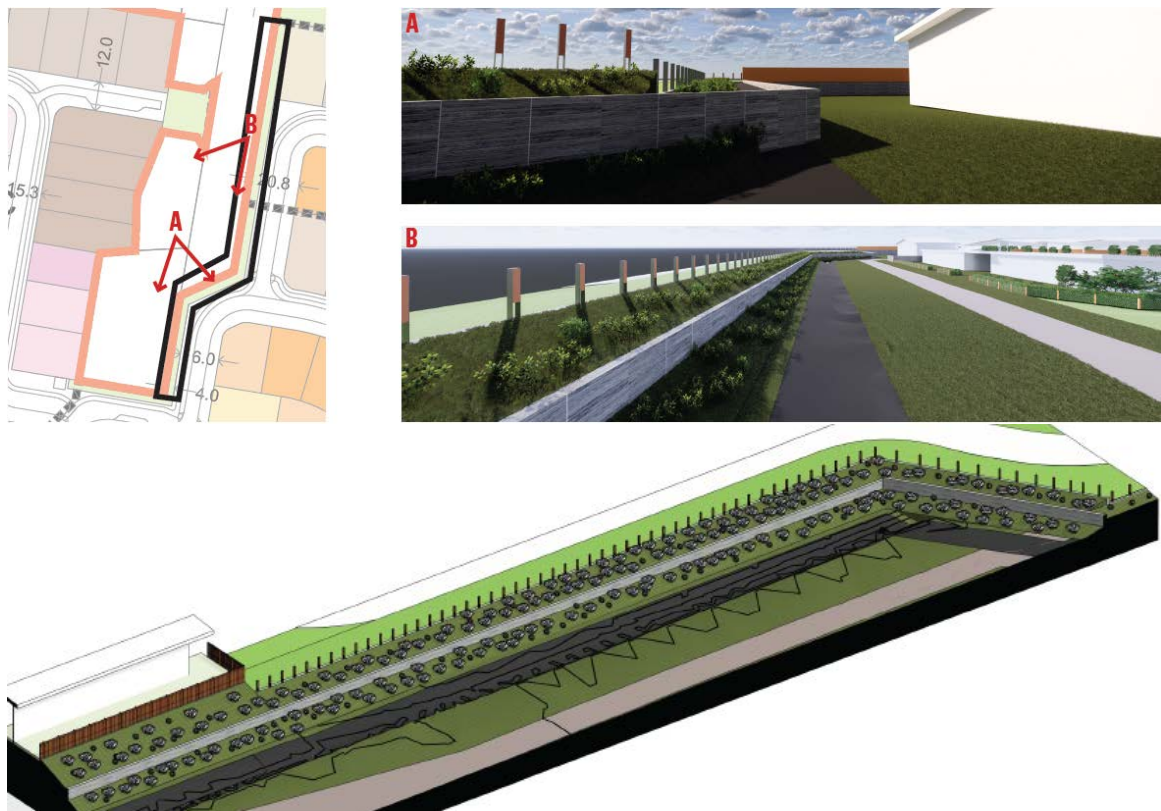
Plan showing perspectives from 12 De Vere Road from the east
